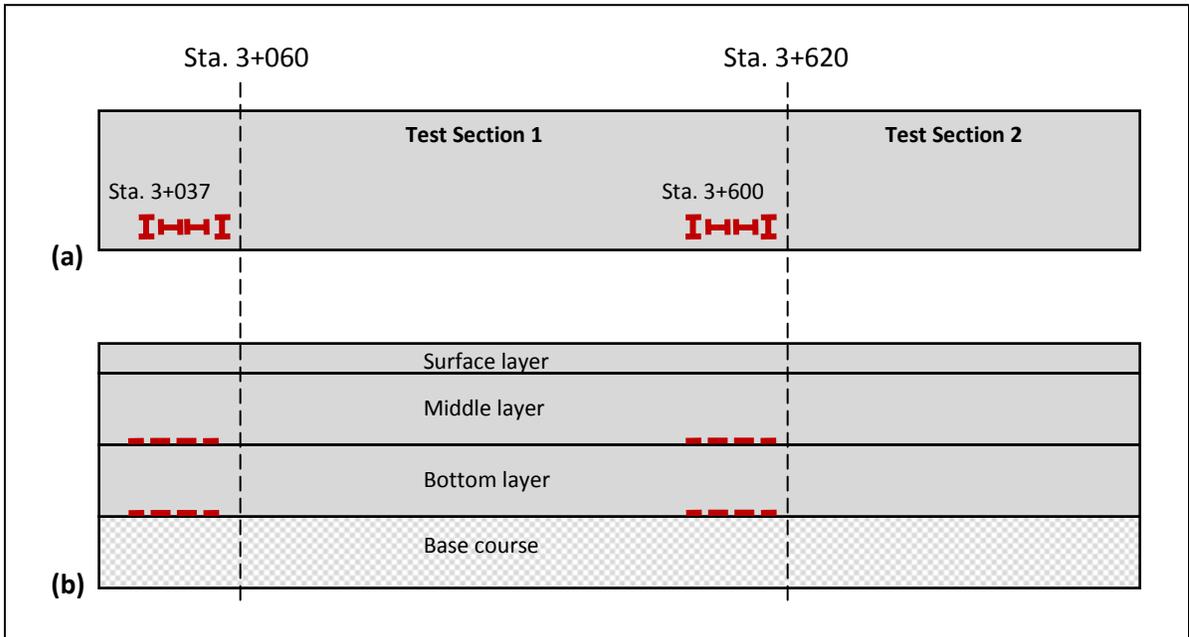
Strain sensor location: (a) plan view, and (b) pavement profile view.
